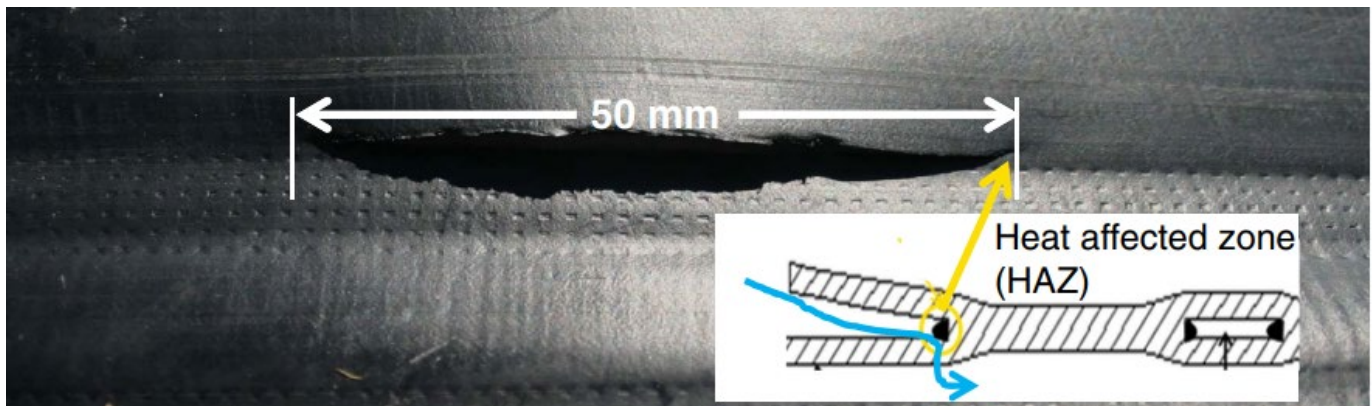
Tear on the underside of a white (upper surface) geomembrane adjacent to the weld (not visible to the inspector without lifting the flap) and not detected by a weld pressure test or some ELLS methods.
